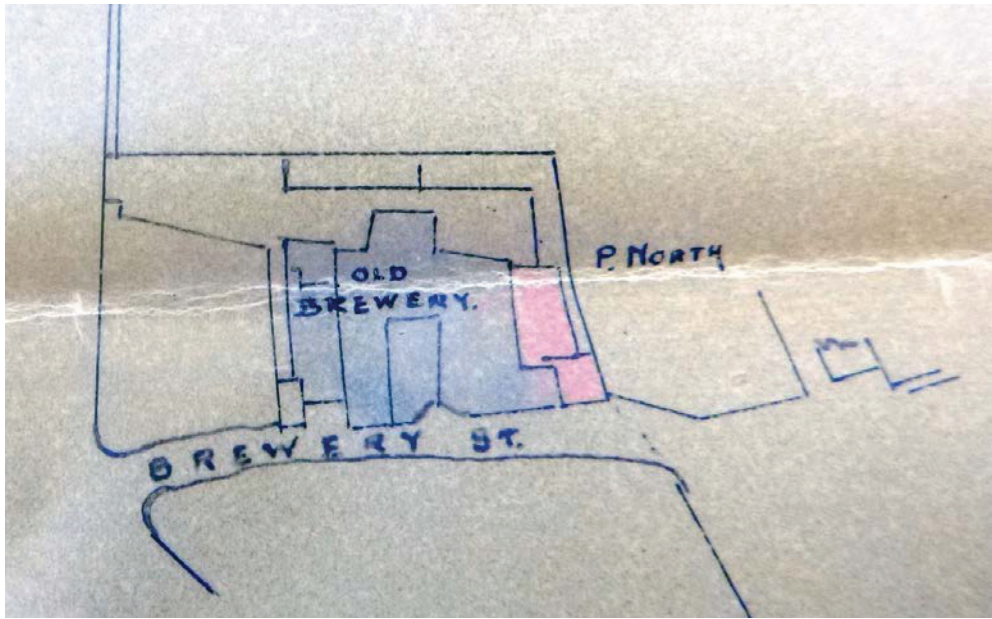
Block plan for proposed addition to the Old Brewery, 1912 (north is to the left)
